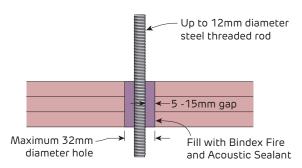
Up to 12mm steel diameter threaded rod Maintains RISF and FRL of ceiling under floor/roof systems Valid for 3 layers only Section
